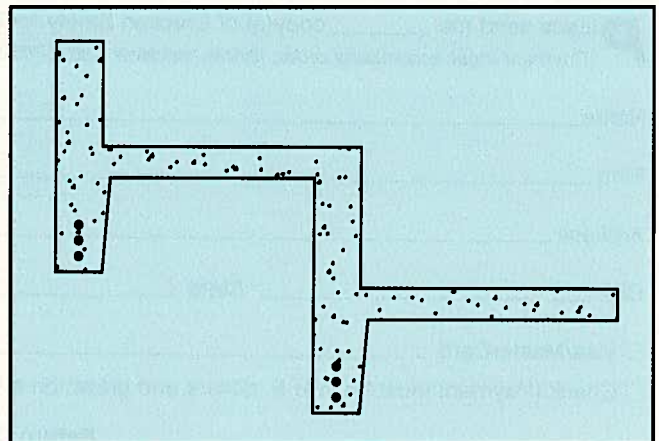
Typical double hammerhead or stemmed tread and riser seating unit.
